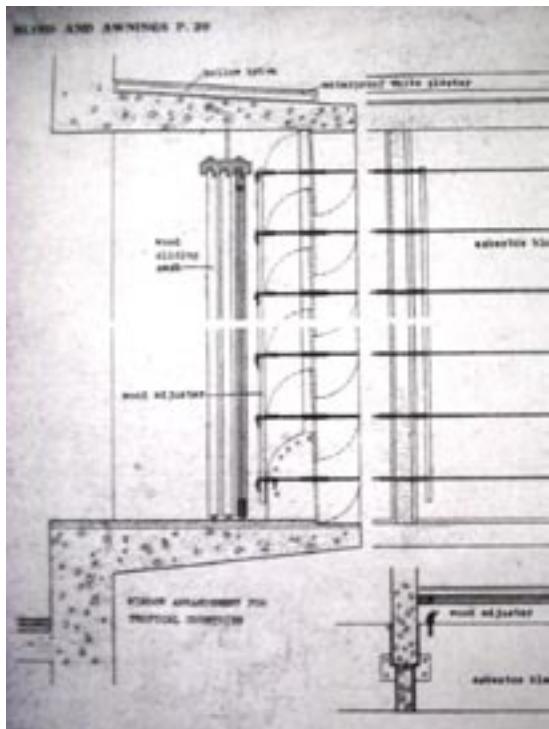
Detail of the wooden system for rotating the louvres of the façade. Antonin Raymond. Architectural Details, page, 29.
